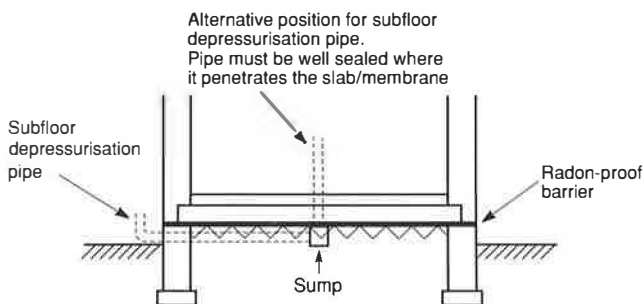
Radon-proof barrier in in-situ or ground-supported concrete floor
